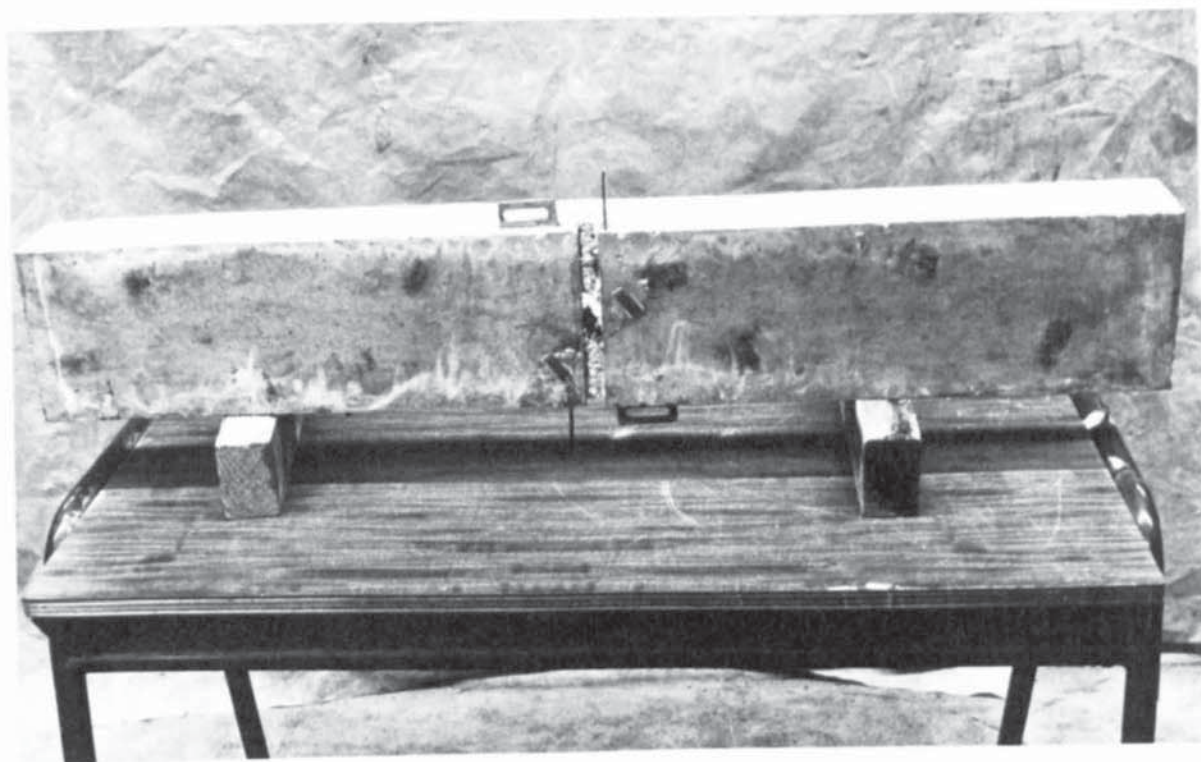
ARTIFICIAL CRACK (MONO - BAR CONCRETE STRIP)
